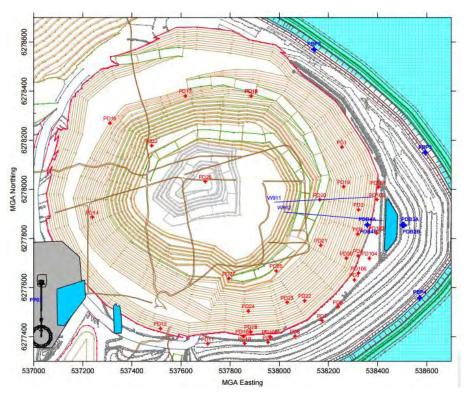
Site Layout and Groundwater Monitoring Bore Locations (Pit Area).
